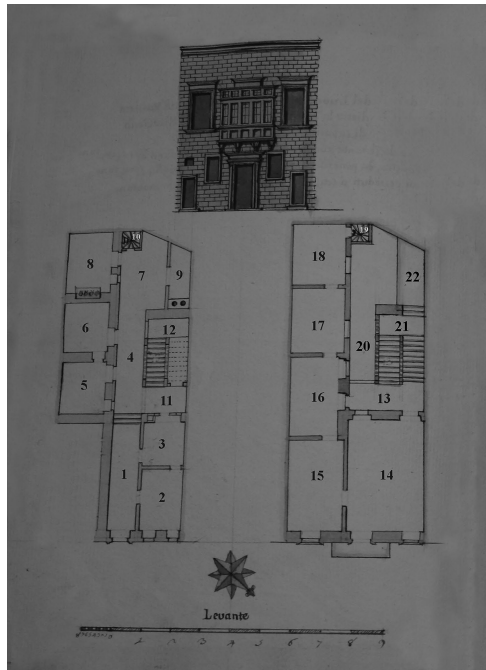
Cabreo* 307 (folio 30): plan of the Valletta townhouse.
